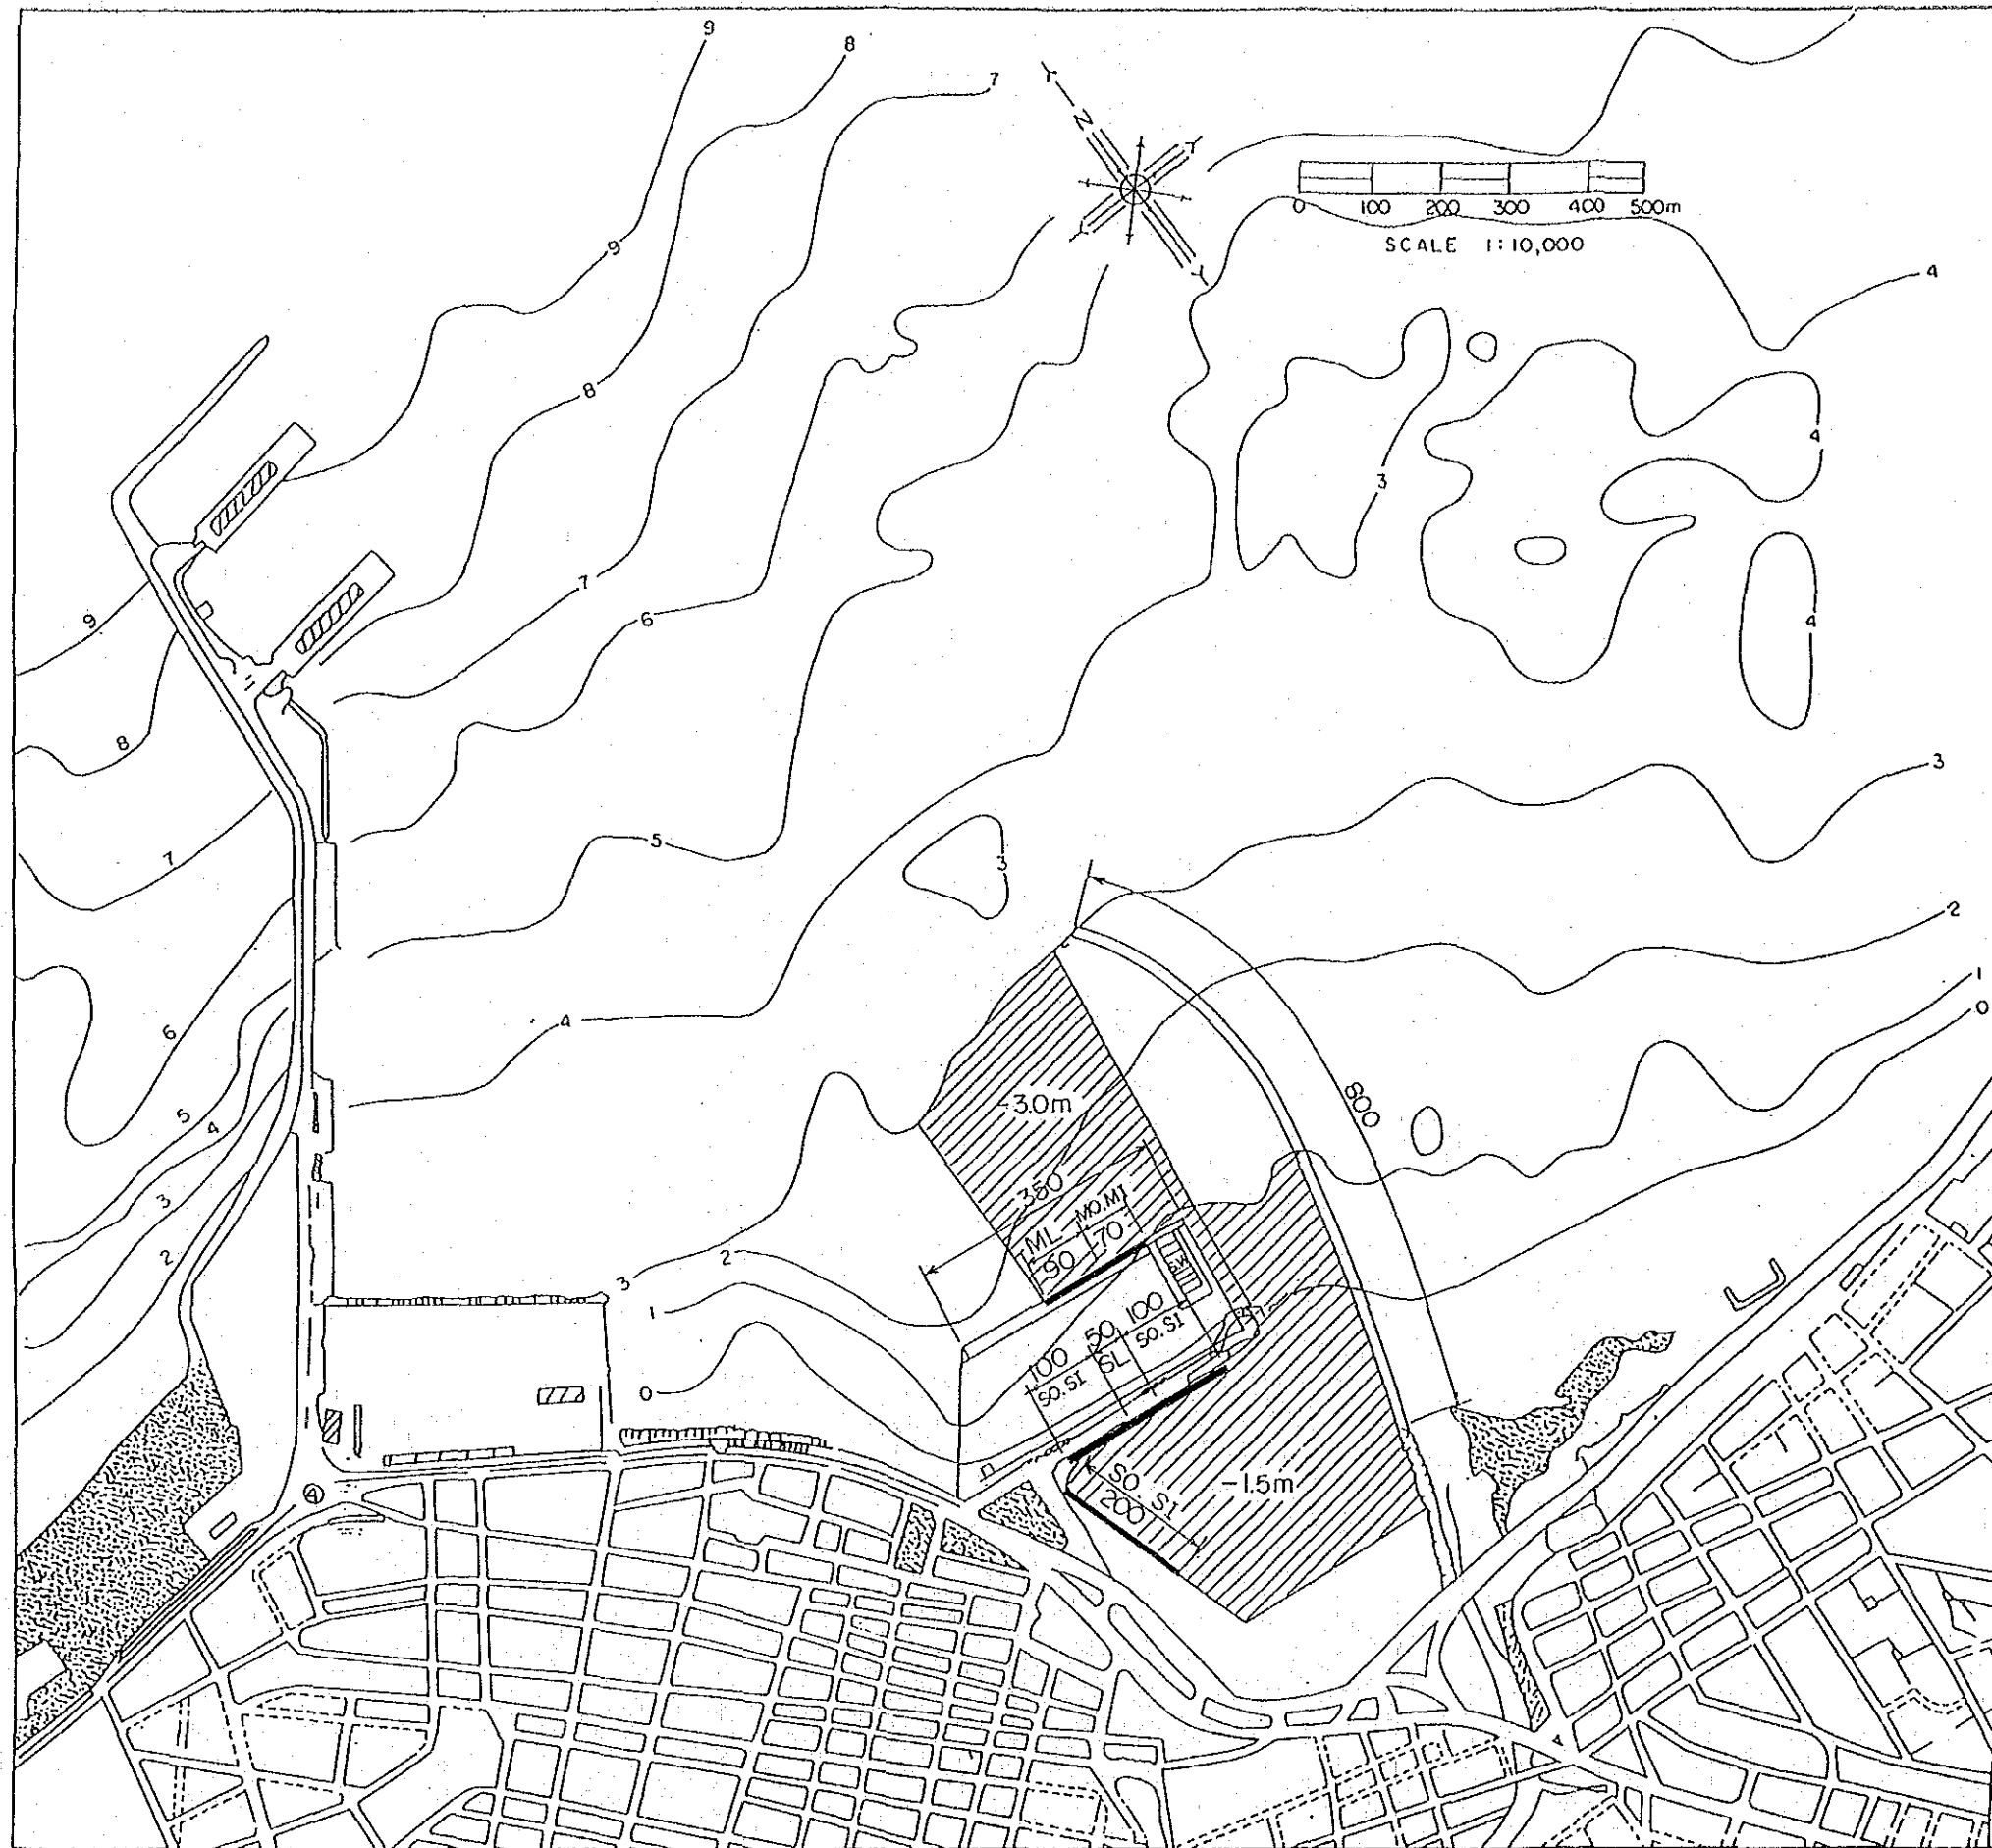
Short-Term Development Plan Alternative-2 for Manta
